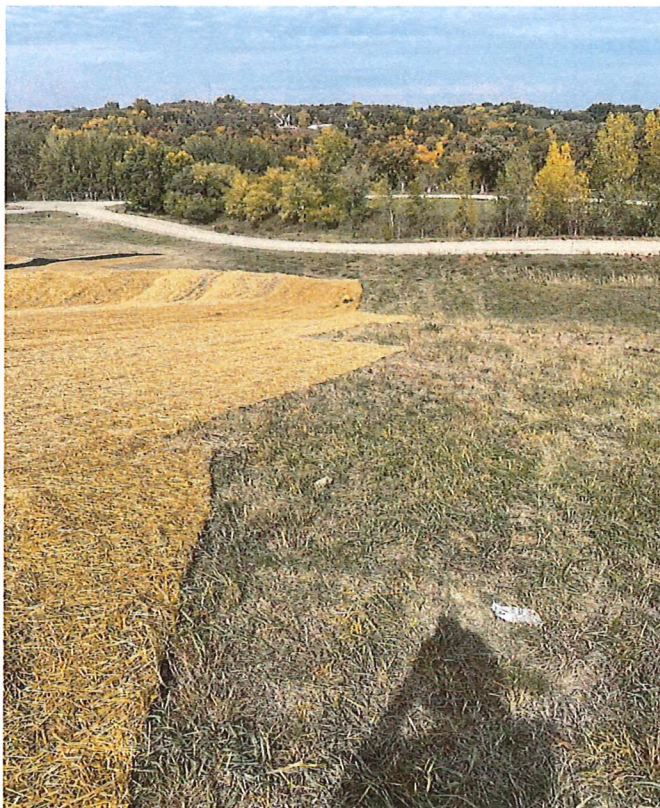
Erosion control blanket placed over final cover along north half of tie-in to existing liner; looking north.
